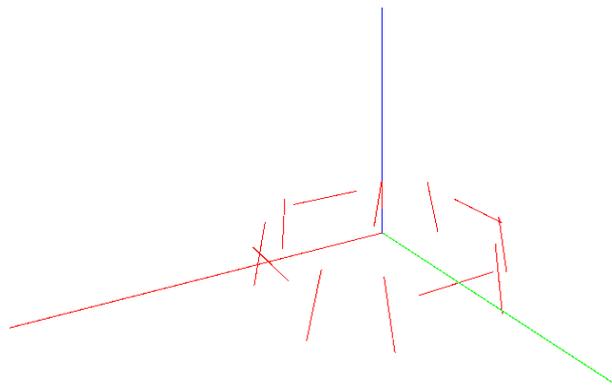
Refined Strut and Tie Layout for Four Piles Pile Cap (Span/Depth=2)
